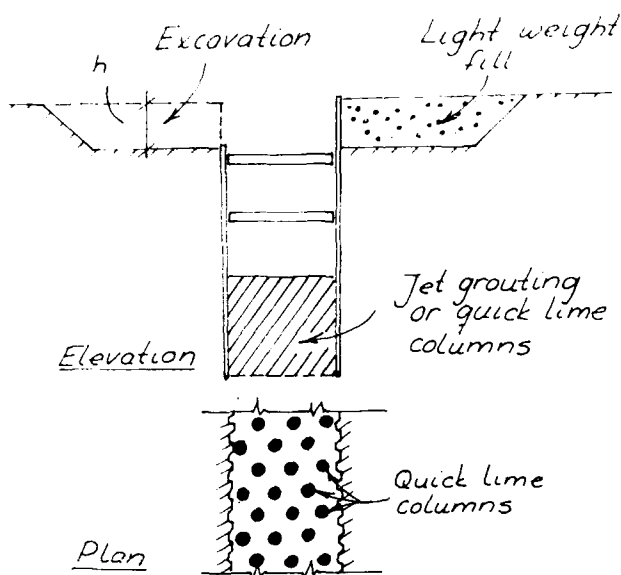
Stabilization with light-weight fill, jet grouting or quicklime columns
